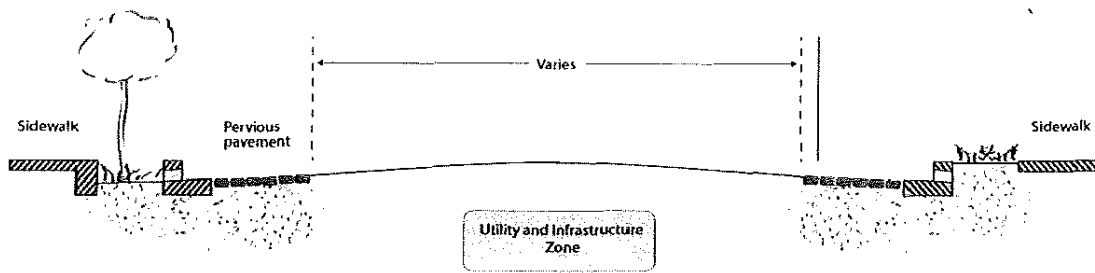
Possible pervious pavement design layout (*Model for Living Streets Design Manual, 2011*).
